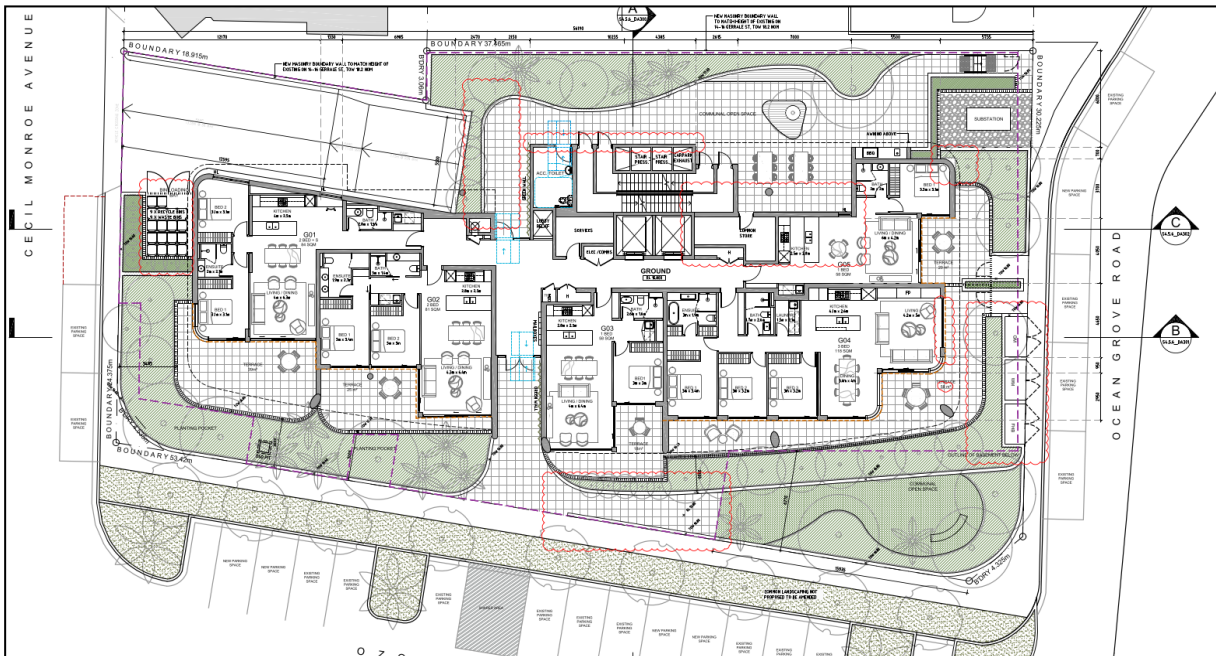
proposed ground floor plan (source: Applicant's revision 1 plans)
